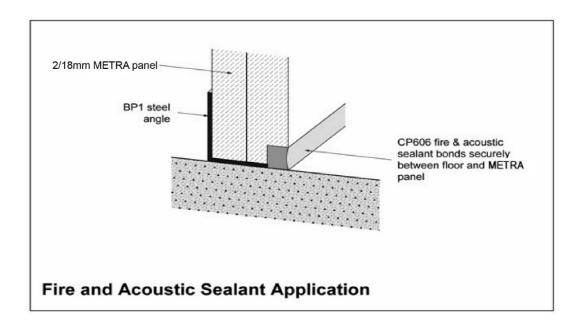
130mm/STC57 IT wall fire and acoustic sealant rebate
